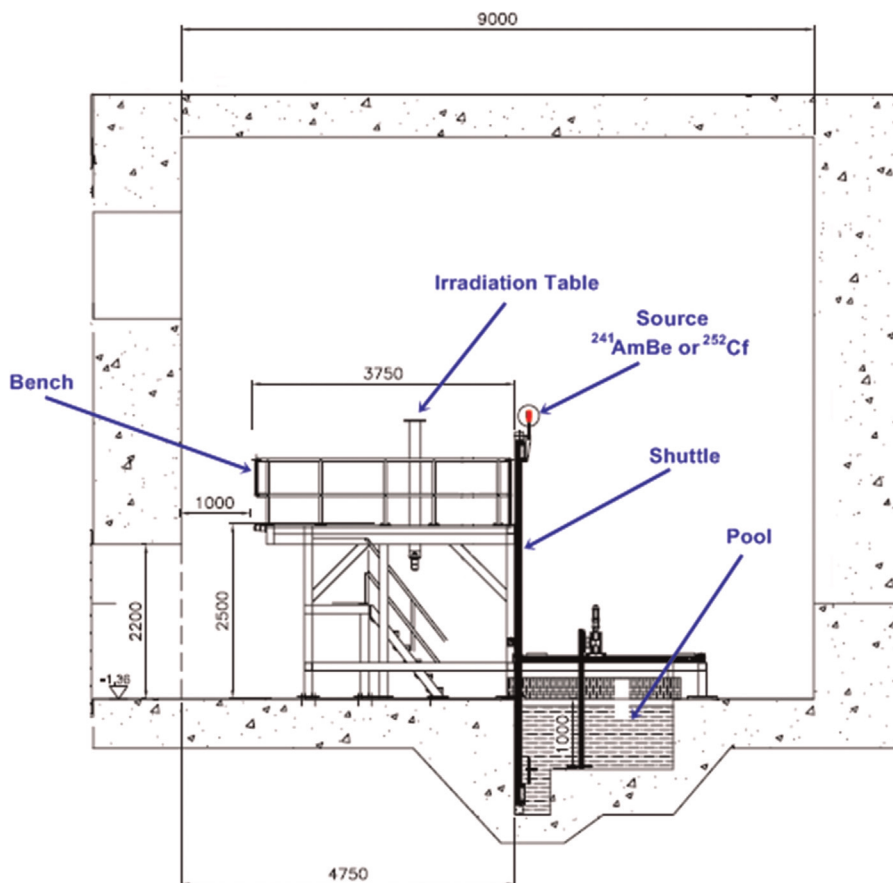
Side view of LPN-CIEMAT, dimensions are in mm.
